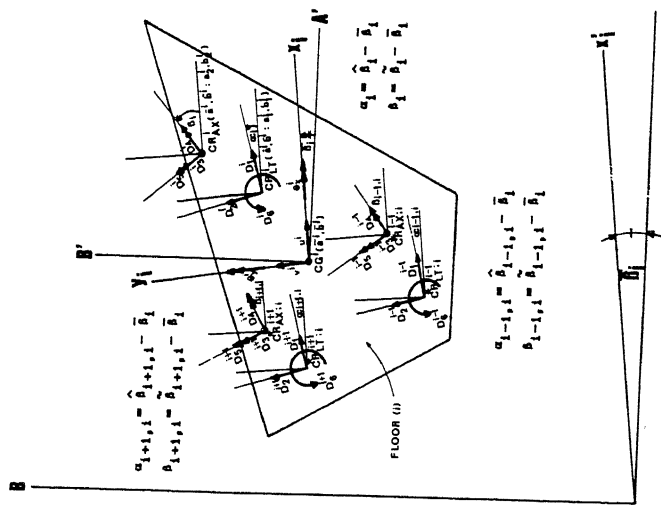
PROJECTIONS OF ADJACENT-FLOOR ELASTIC CENTERS ON FLOOR (i)
